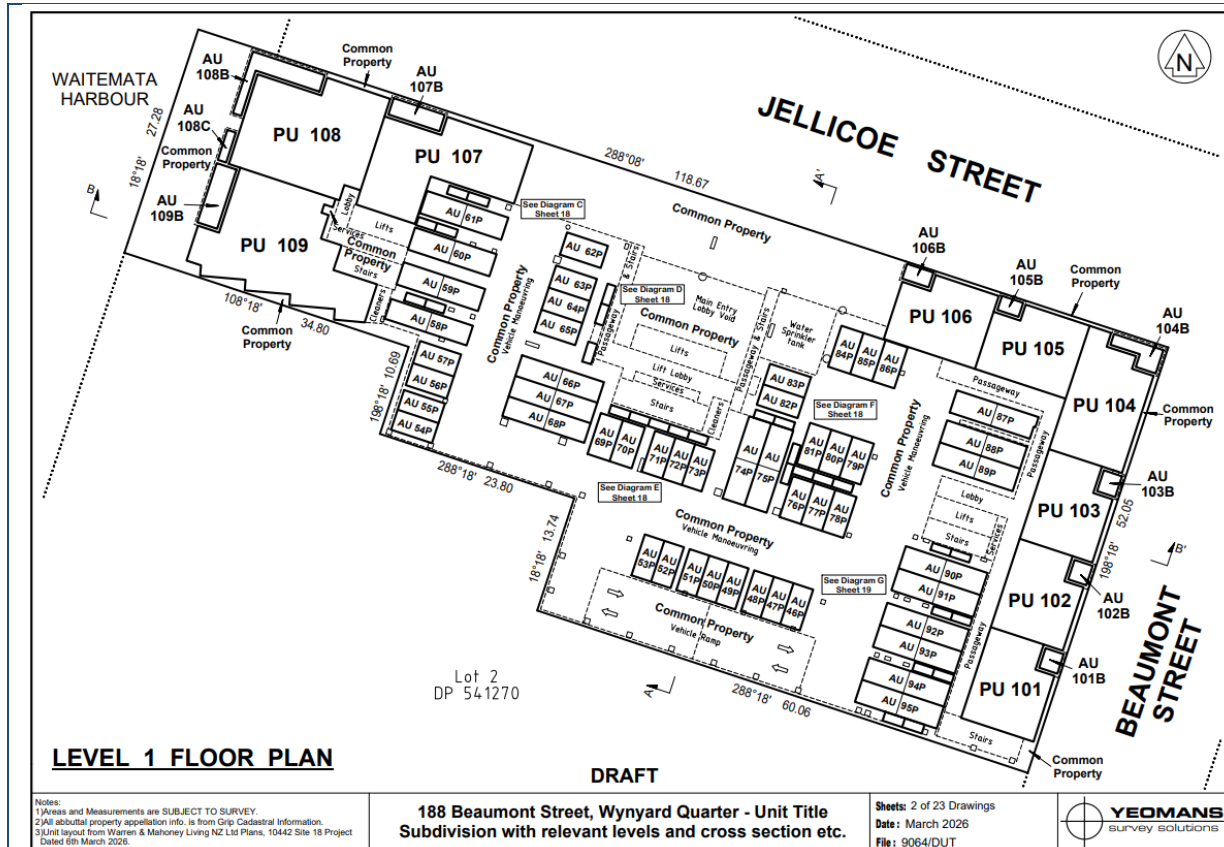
Proposed subdivision scheme plan (Yeomans Survey Solutions, March 2026)
